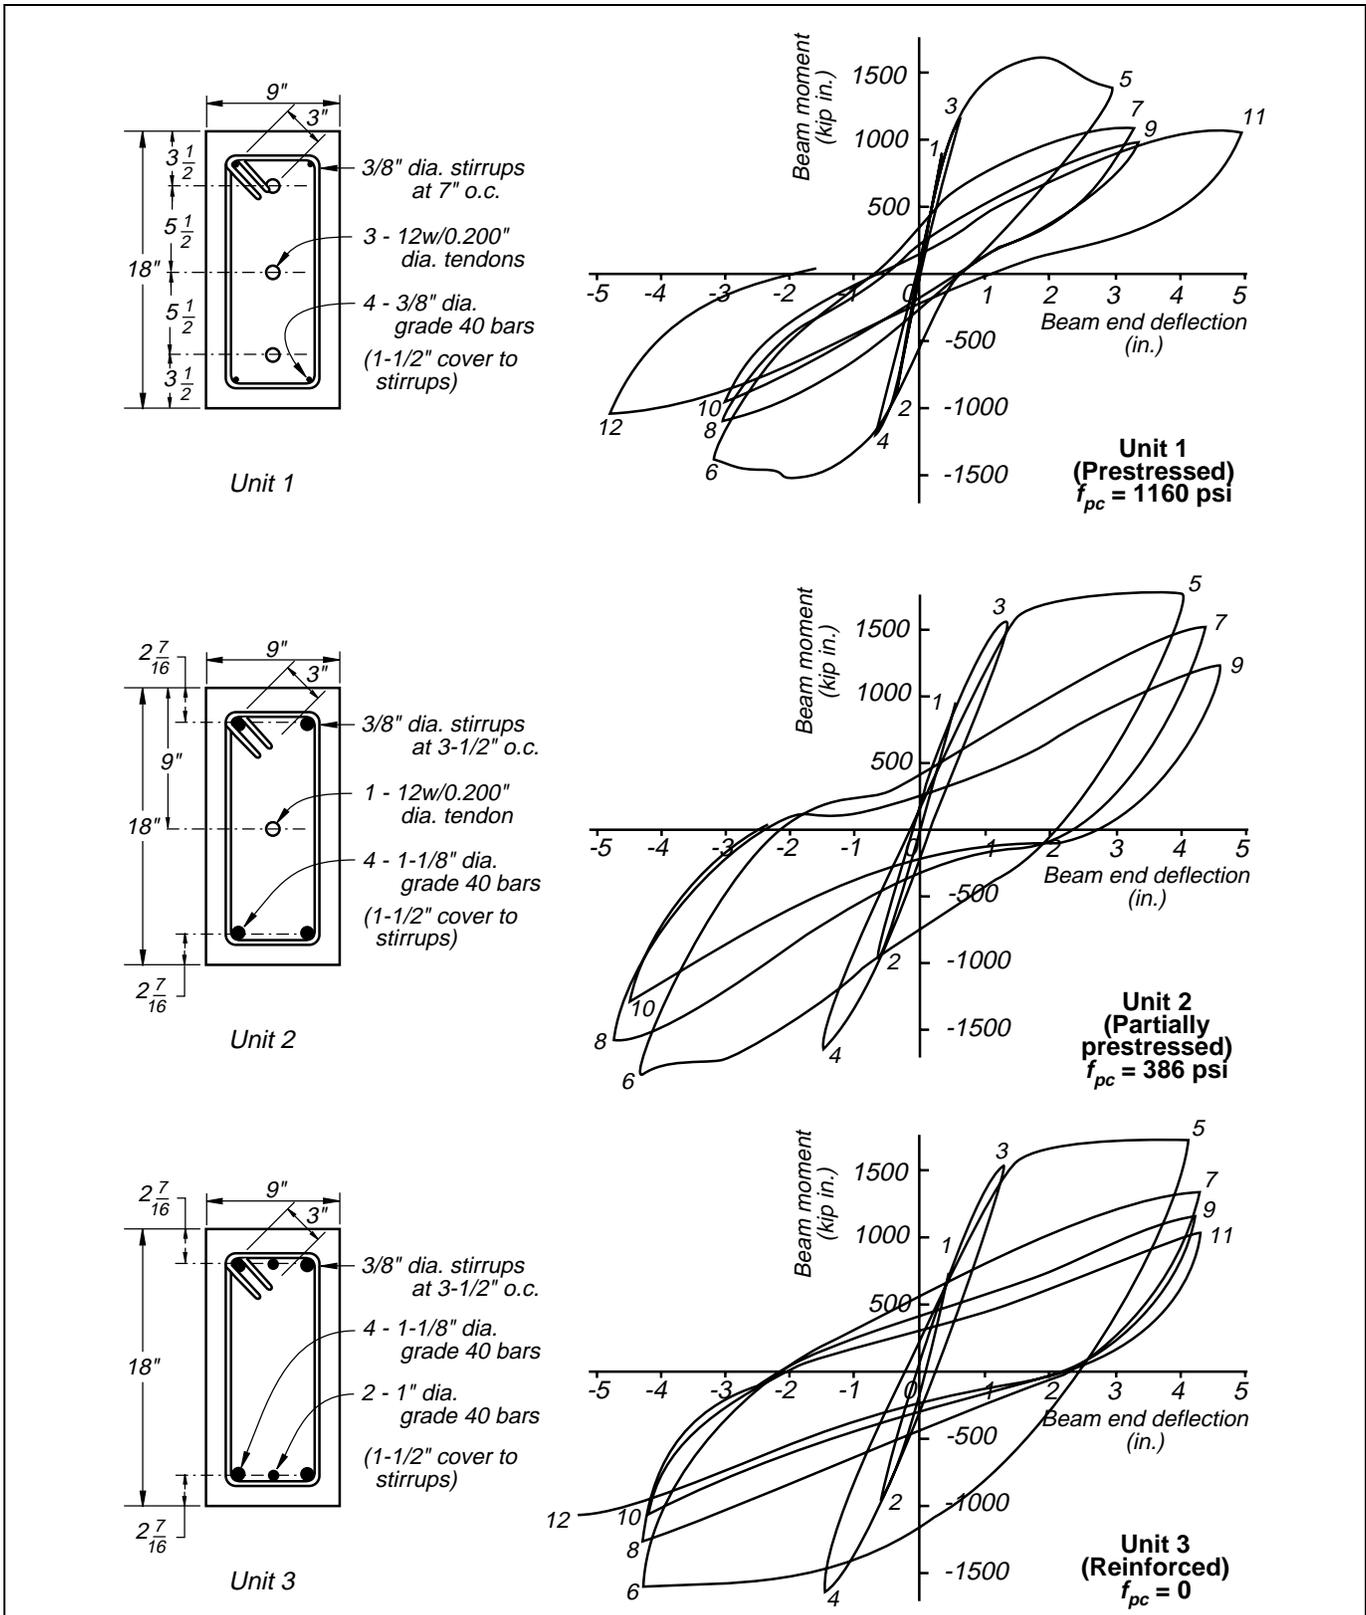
Sample Load-Deformation Relations for Prestressed, Partially-Prestressed, and Reinforced Beams
